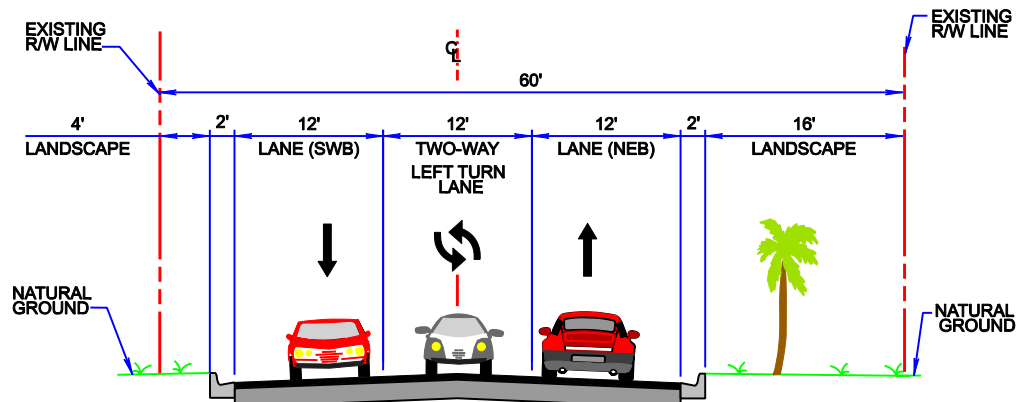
B NW 138th Street from NW 113 Avenue to FEC Railroad (2008)
